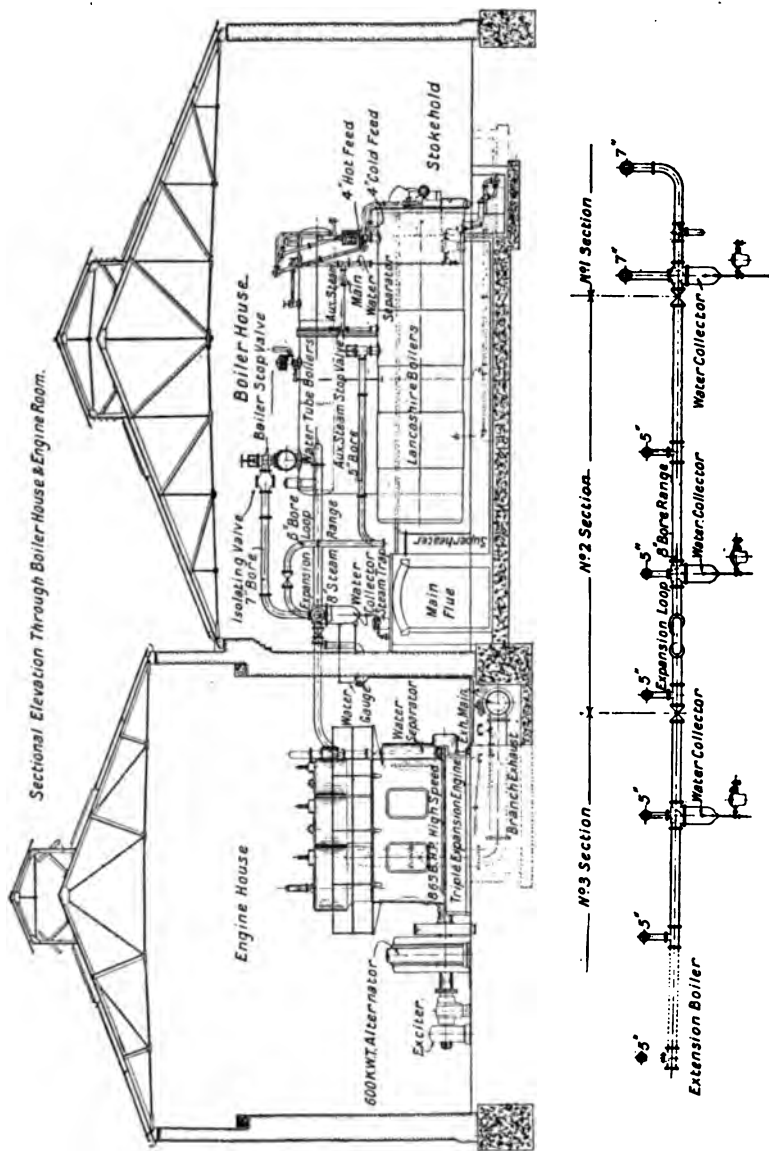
TYPICAL ARRANGEMENT OF STEAM PIPING.
